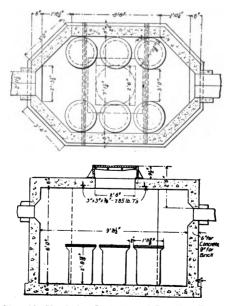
Vault Size 10, Used for Installing 6 Loading Pots on Conduit Runs when not Intersected.
